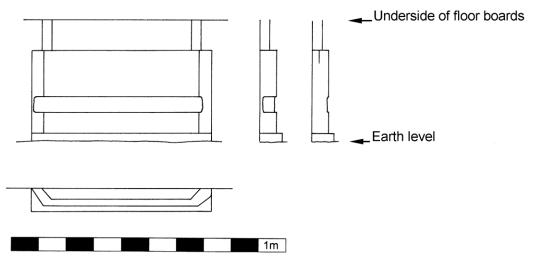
The pilaster-like case in room 134 in the centre of the east wall below the floor boards.
